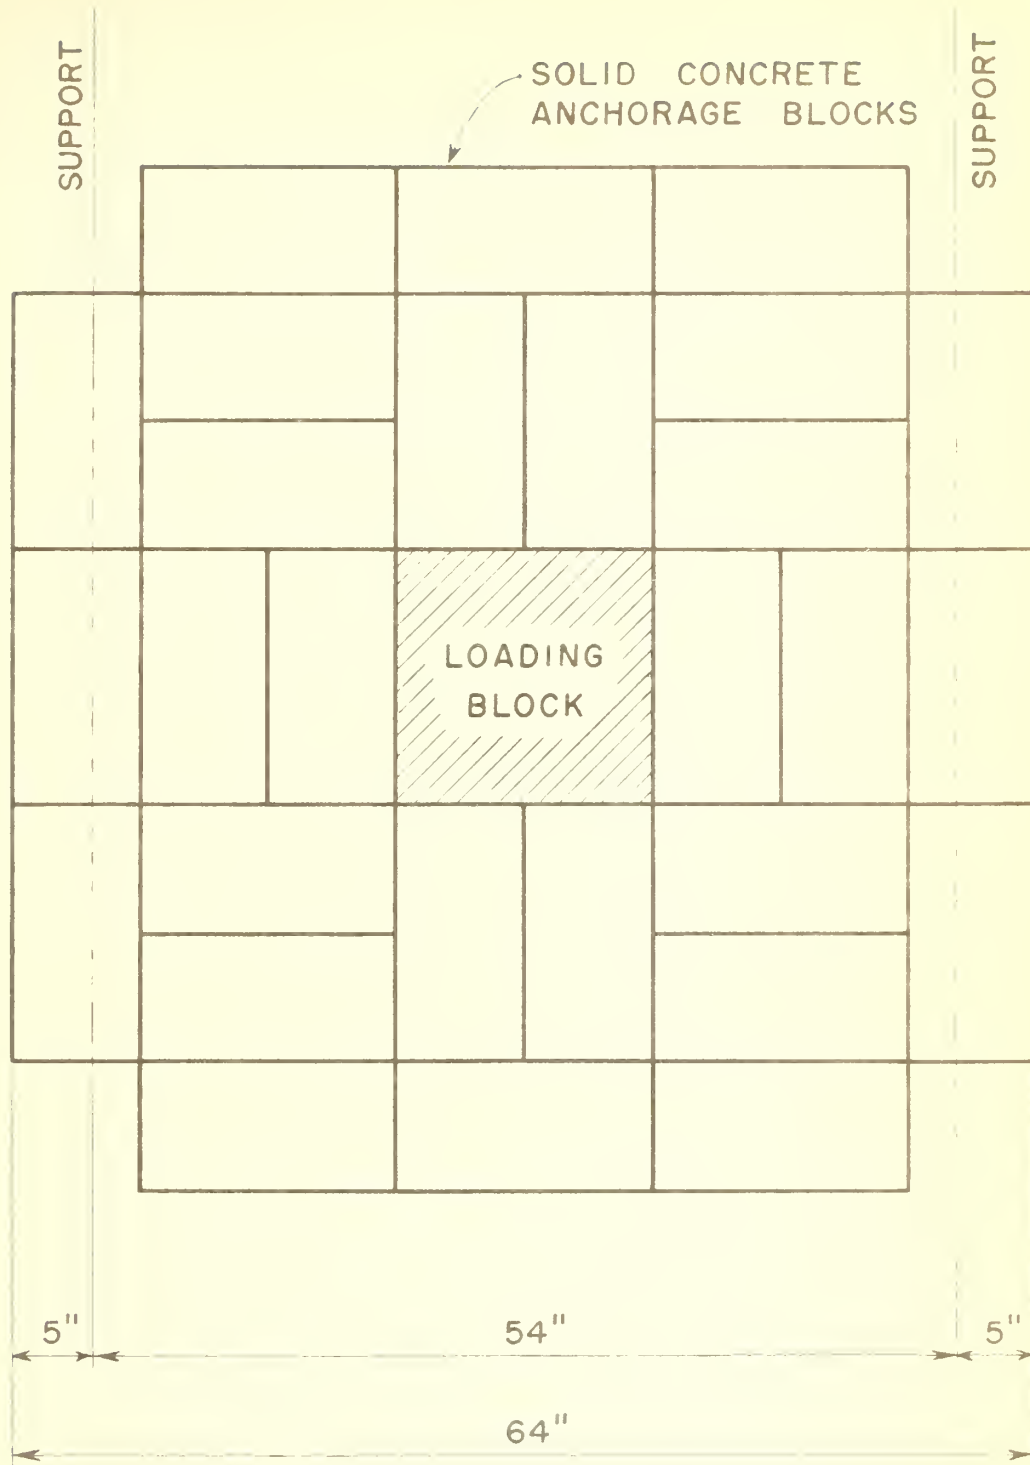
ARRANGEMENT OF PAVEMENT BLOCKS IN SLAB NO. 25
